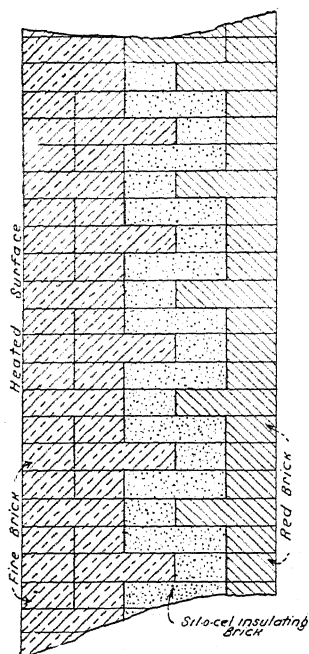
TYPICAL WALL CONSTRUCTION, SHOWING INSULATING BRICK LAID IN WALL.
